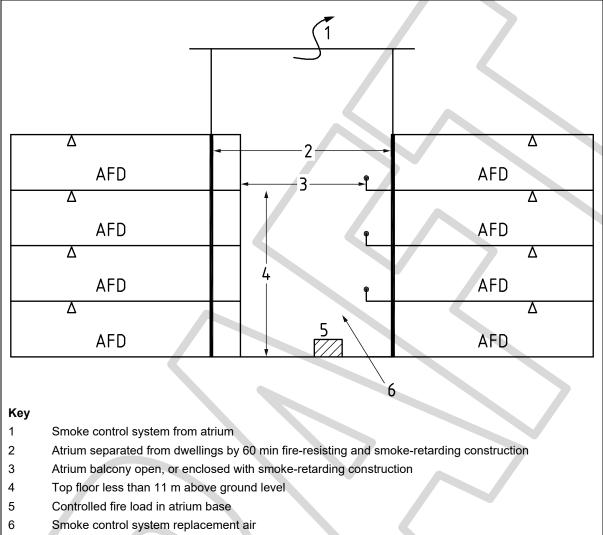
Exemplar 3: Top floor less than 11 m with sprinkler protection
